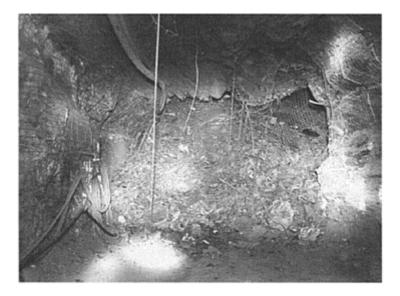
Looking south at the fall of ground at the point of arresting, at the intersection of P3849 SEDR and Q369 CO, 20B Sublevel.
